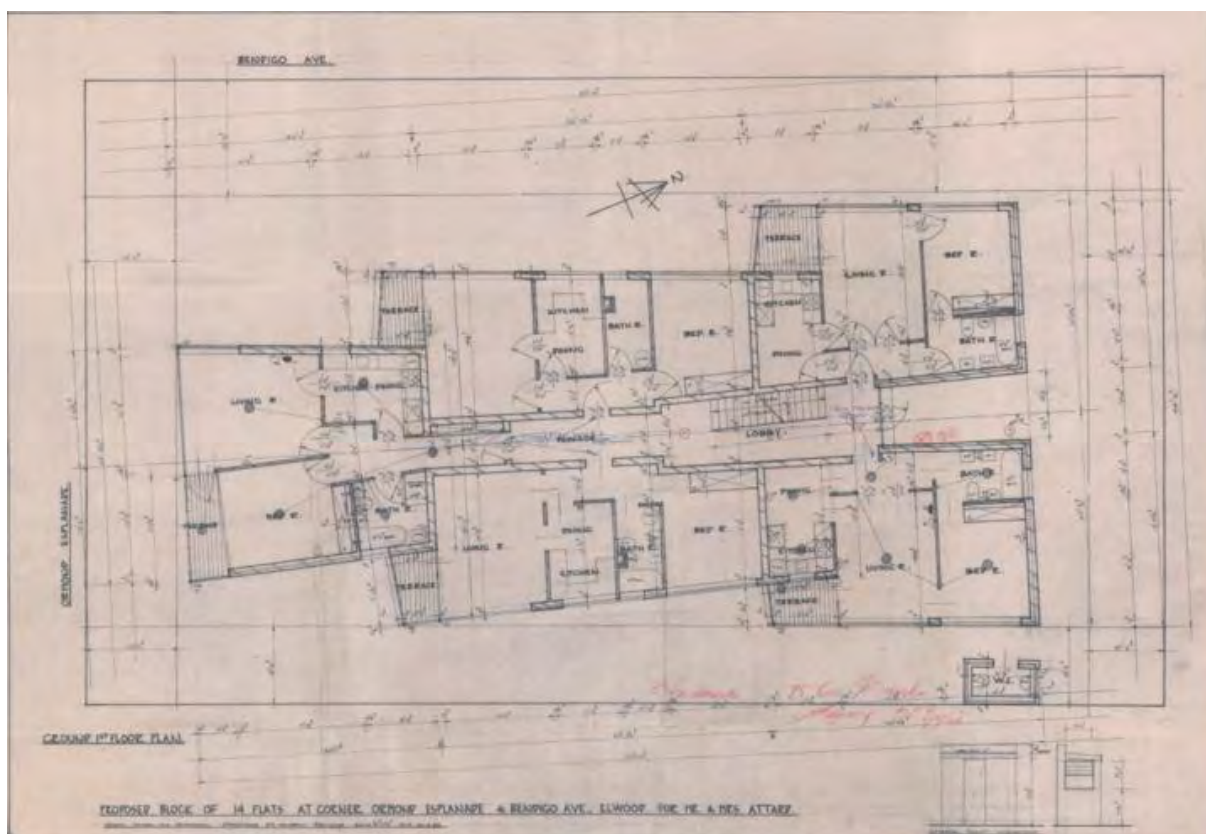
Proposed block of 14 flats at corner of Ormond Esplanade & Bendigo Ave., Elwood for Mr & Mrs Attard (ground floor plan). Source: Michael R. E. Feldhagen. 1963. Drawings of 46 Ormond Esplanade, Elwood. Council Records. City of Port Phillip,
